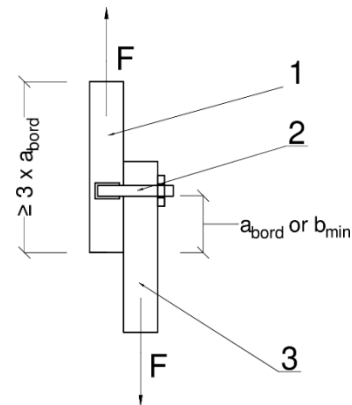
Example of shear load exerted on the test specimen for kits family B (border or corner position).
